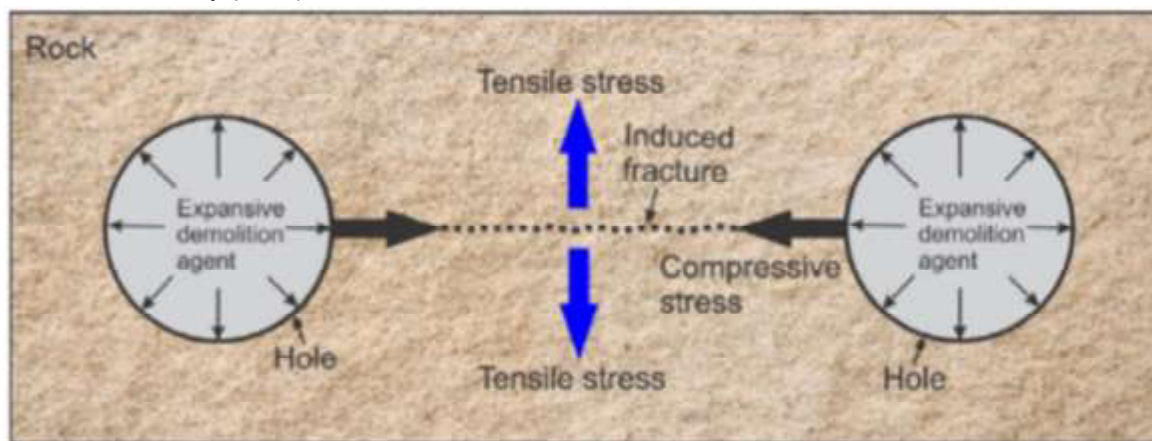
, Showing Mechanism of rock breakage by expansive chemical agents in tow drilled holes
